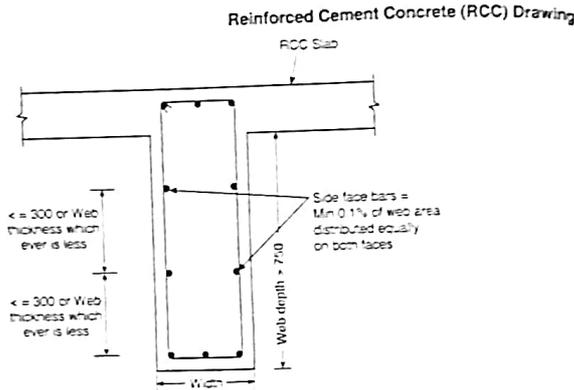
Details of side face reinforcement in beams exceeding 750 mm depth as per IS (456 : 2000)
